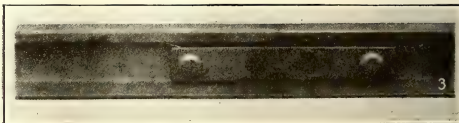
Fishplate with center fillet ready to assemble on joint.
